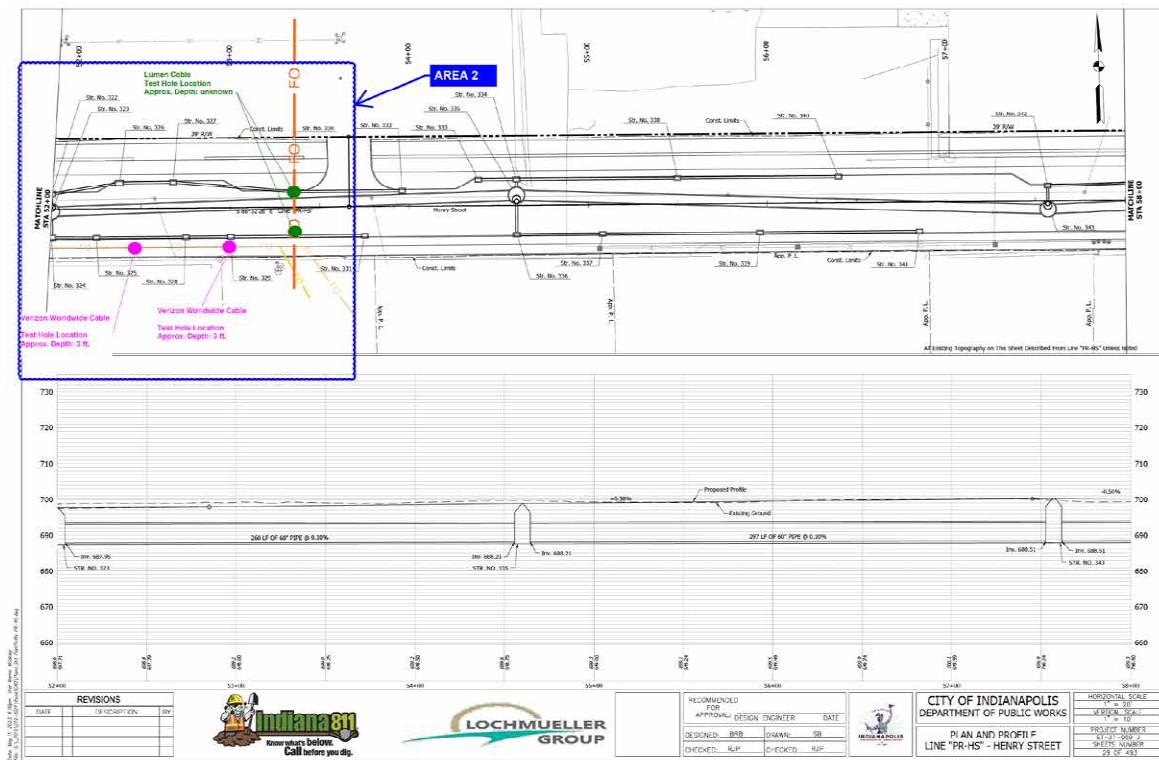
CAD DRAWING SHOWING THE SUE TEST LOCATIONS IN AREA 2.
